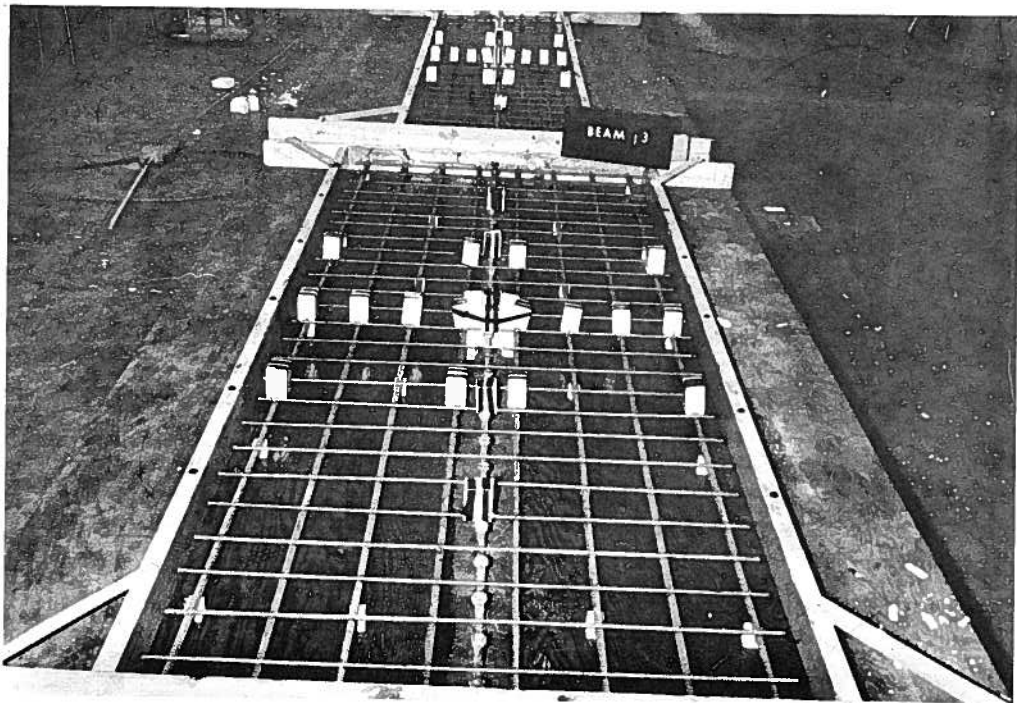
SPECIMEN PRIOR TO CASTING
